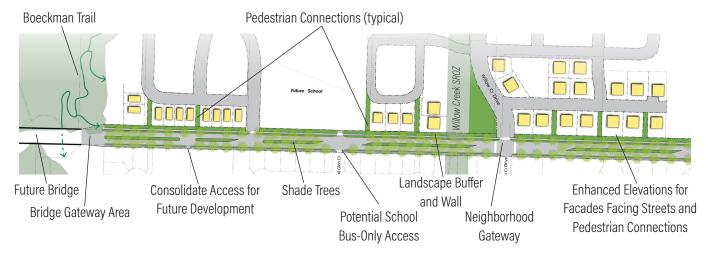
Boeckman Road and Stafford Road Frontage Improvements
